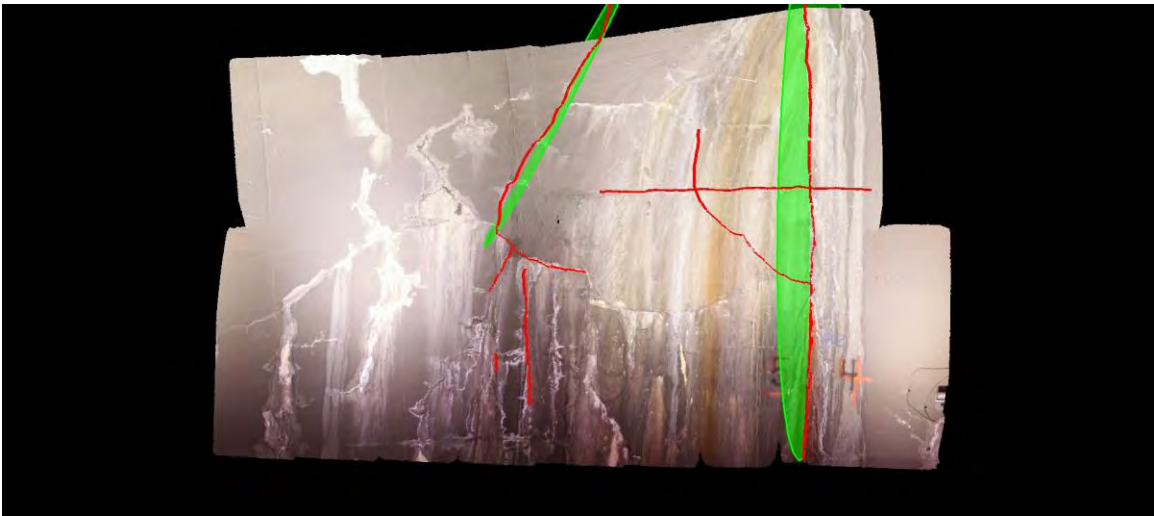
Eisenhower-Johnson Tunnel: clean air supply duct south-west ventilation building: view of the south lining wall from within the duct with digitized features.
